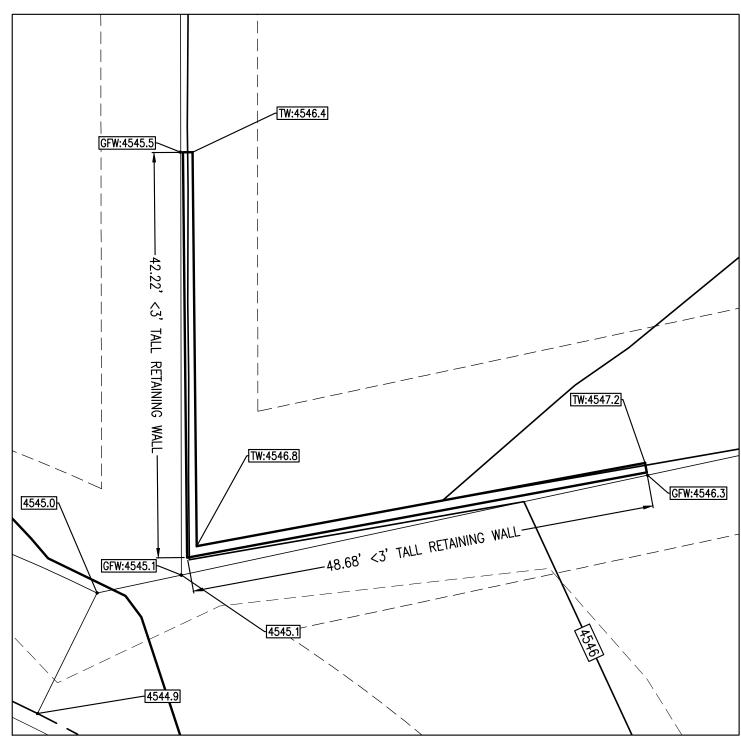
DETAIL 'A' - CONCRETE TRAIL LOW POINT SCALE: 1" = 10'
